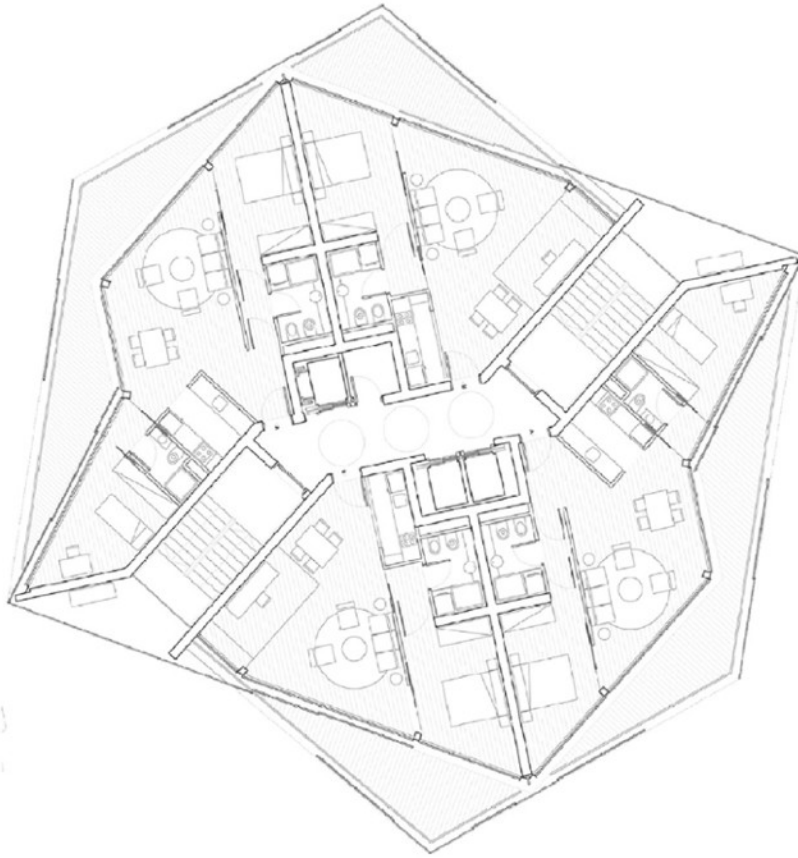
Torre Aquileia, Carlos Ferrater. Plan showing the intricate layout of the four residential units (2008).
